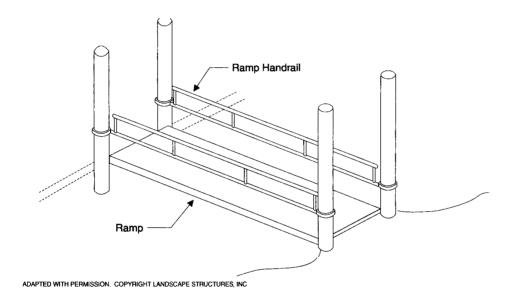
Ramp for Wheelchair Play Equipment Access.
